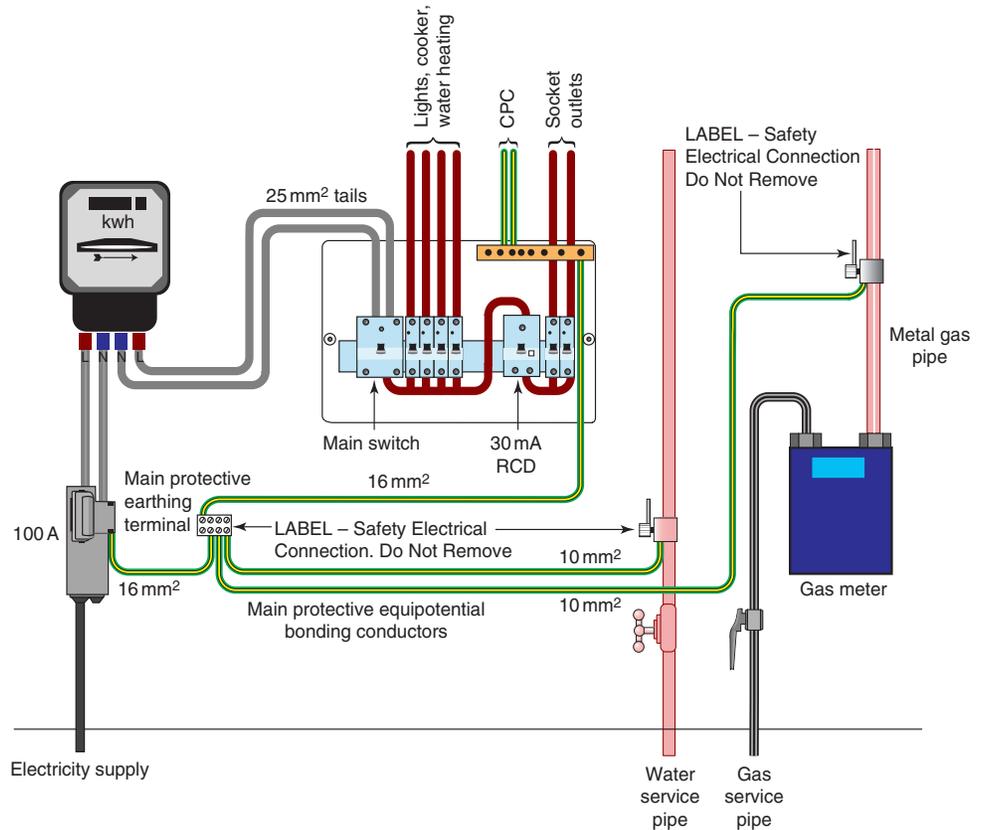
Protective multiple earth supply (TN-C-S system) showing earthing and bonding arrangements.
